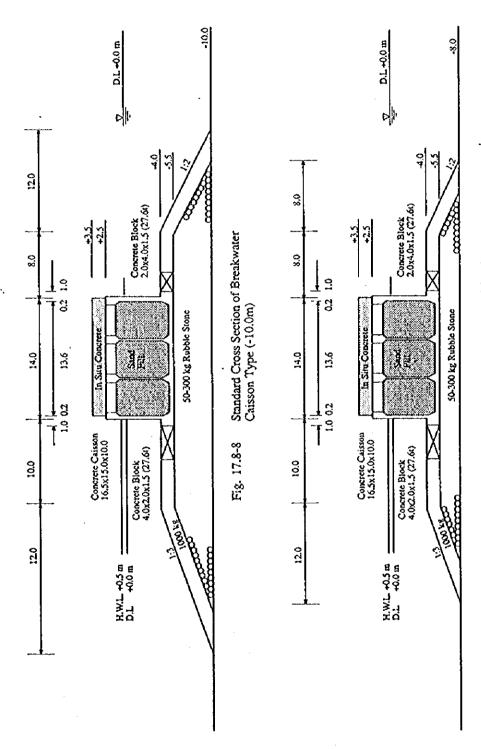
Standard Cross Section of Breakwater Caisson Type (-8.0m)
